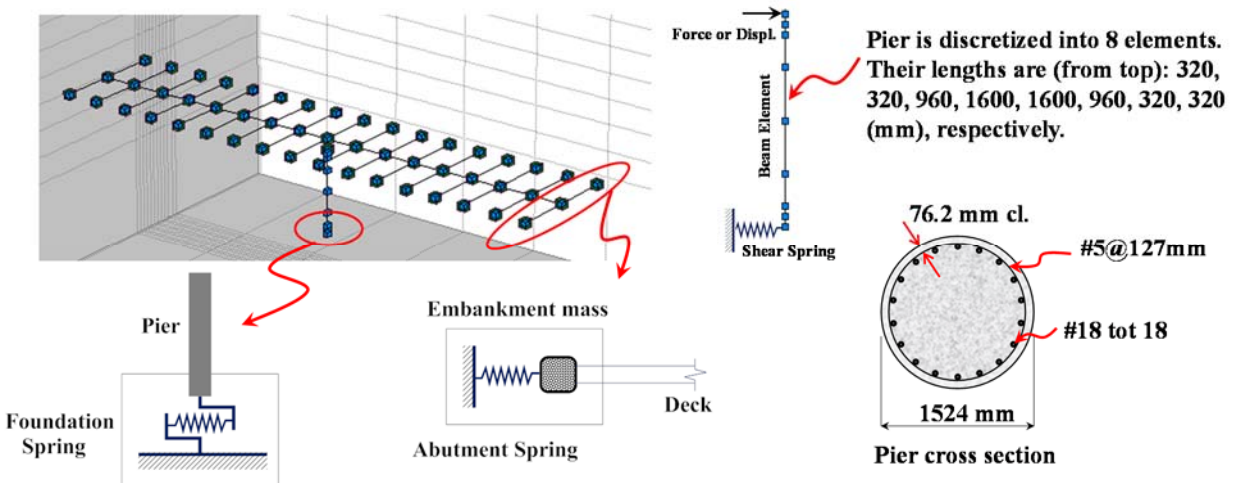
Finite element model of MRO Bridge (Zeus-NL) and pier cross section
